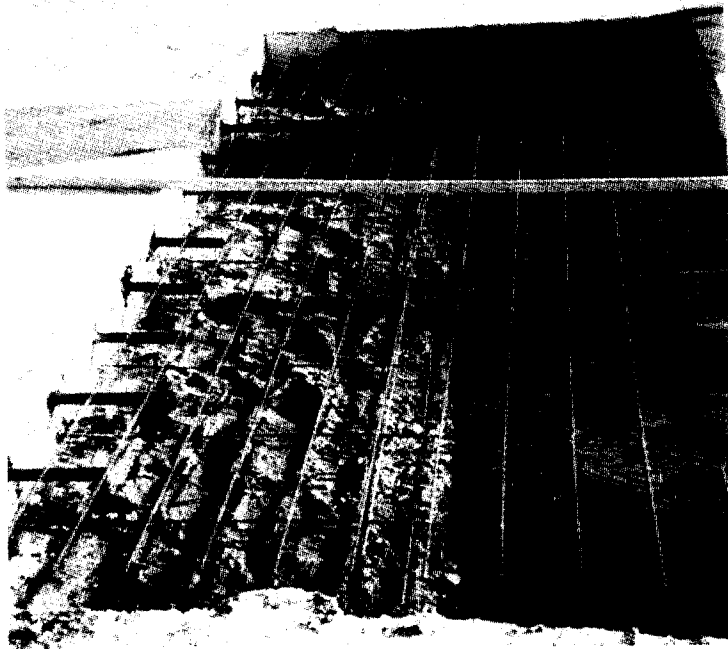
Picture of a Patch with Dowel bars and Welded Wire Fabric in Place.
